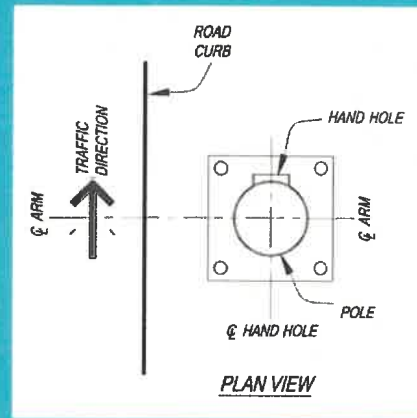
Recommended Orientation of a Hand Hole
